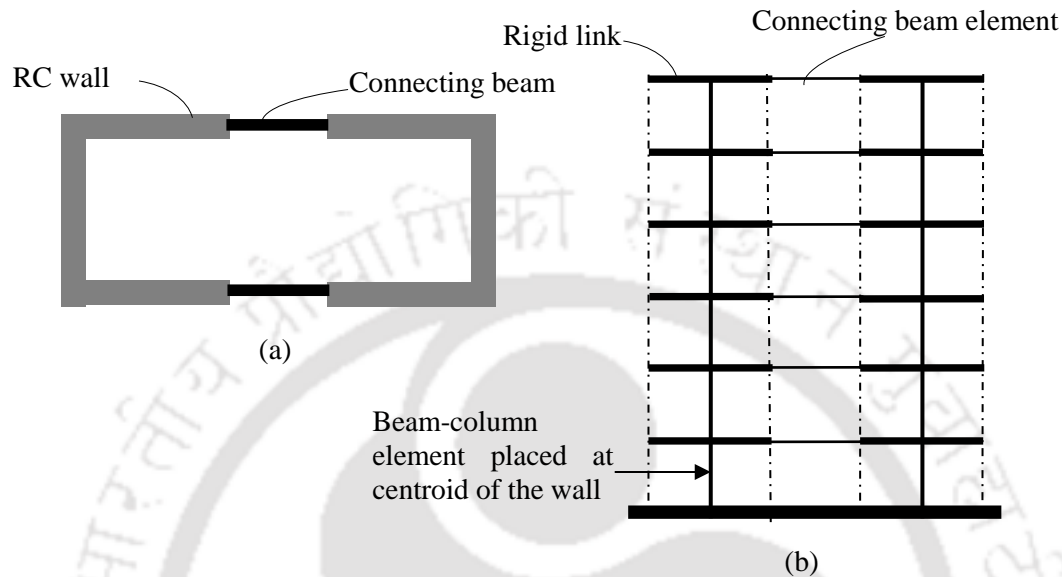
Equivalent frame model in walls: (a) plan of RC frame wall system and (b) equivalent frame model.
